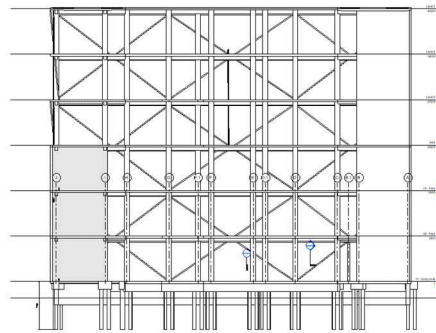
Elevation from BIM Model of a wood Structure 12-story building.
